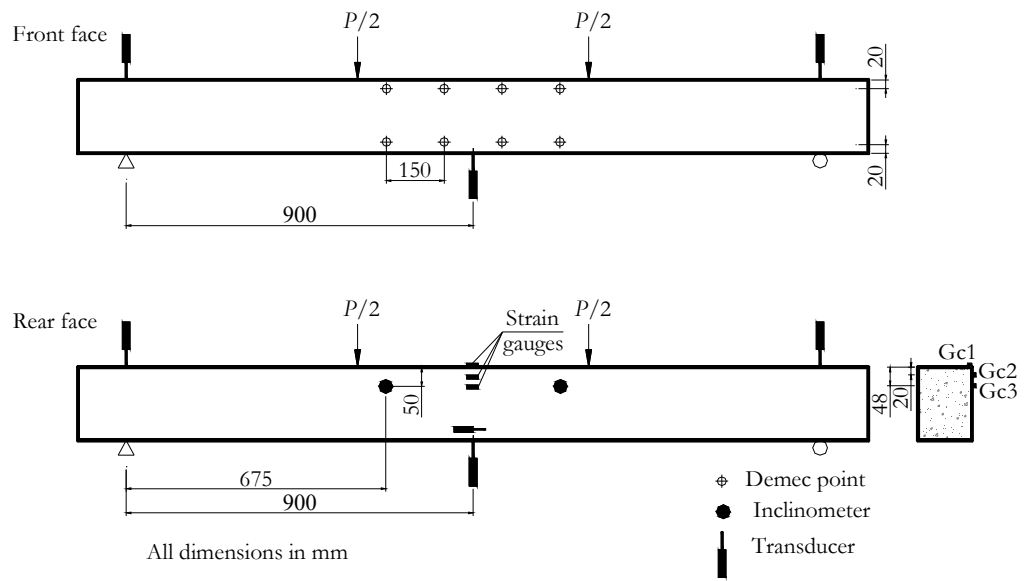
Instrumentation details for beam C2-212-D1-B.
